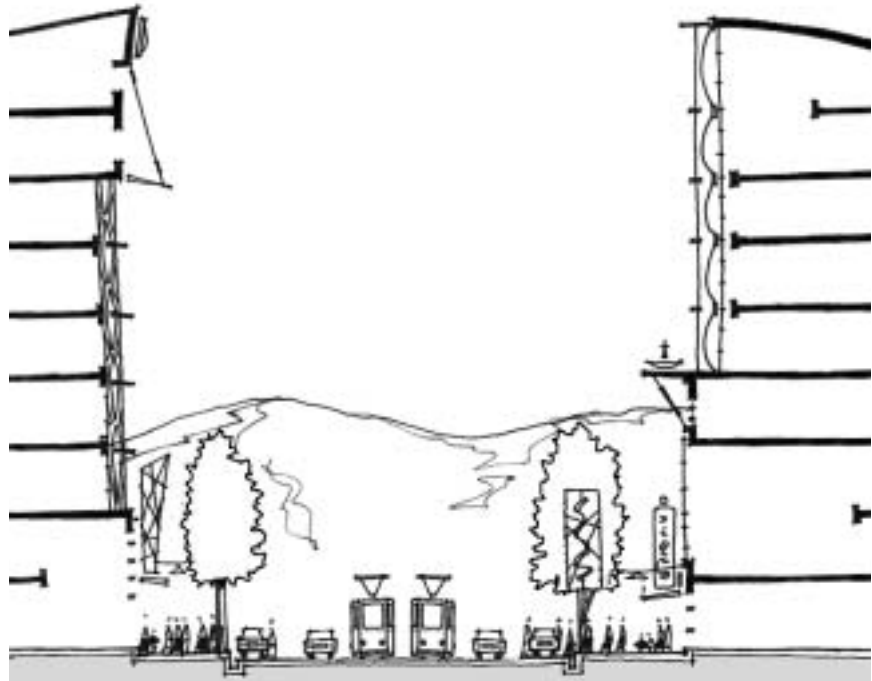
Section: 100' Right of way. Light rail, generous sidewalks, shade trees, 1 travel lane, 1 off-peak curb parking lane each way.
